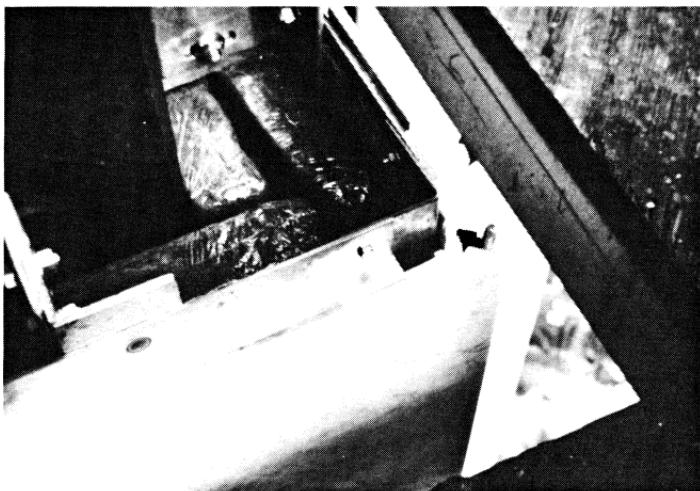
View of stainless steel bent plate angle that supported the marble panels.
